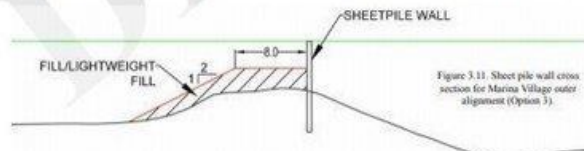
Sheet pile wall cross-section for Marina Village outer alignment (Option 3).
